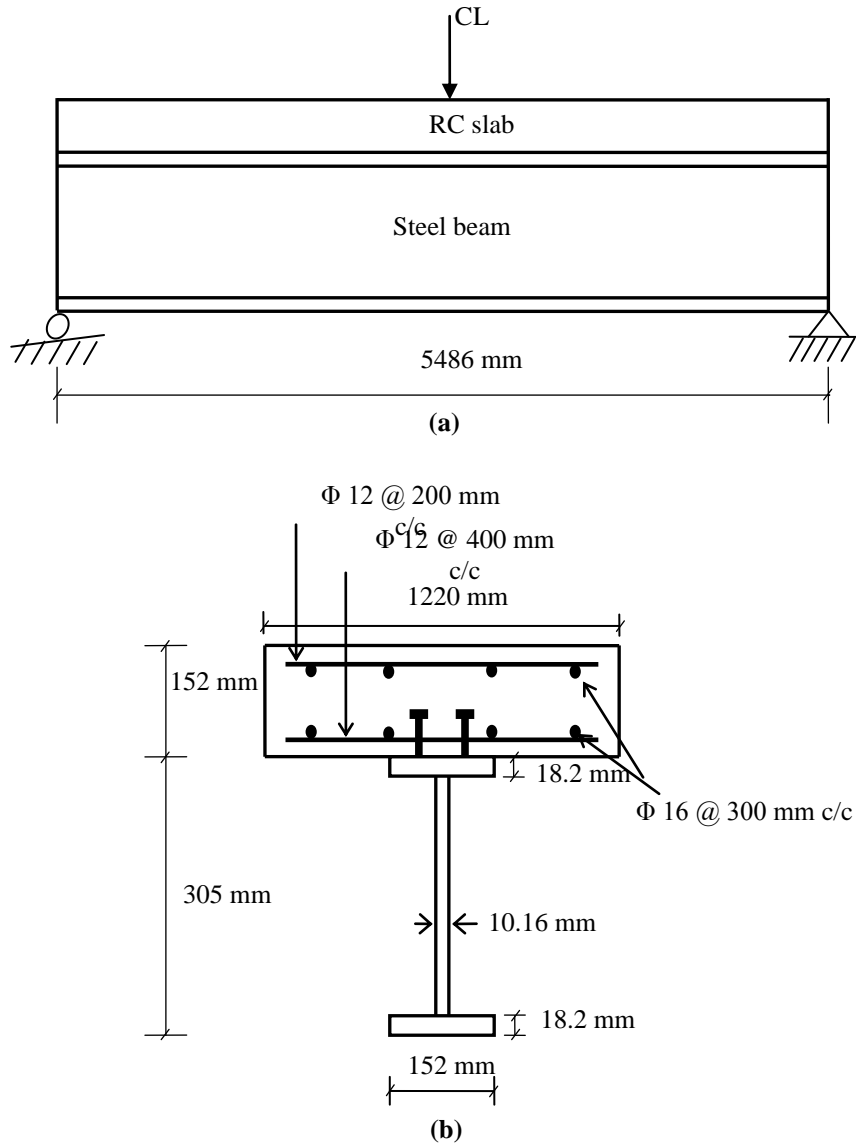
Yam and Chapman test beam (a) dimensions and loading arrangement of beam (E 11) (b) cross section
